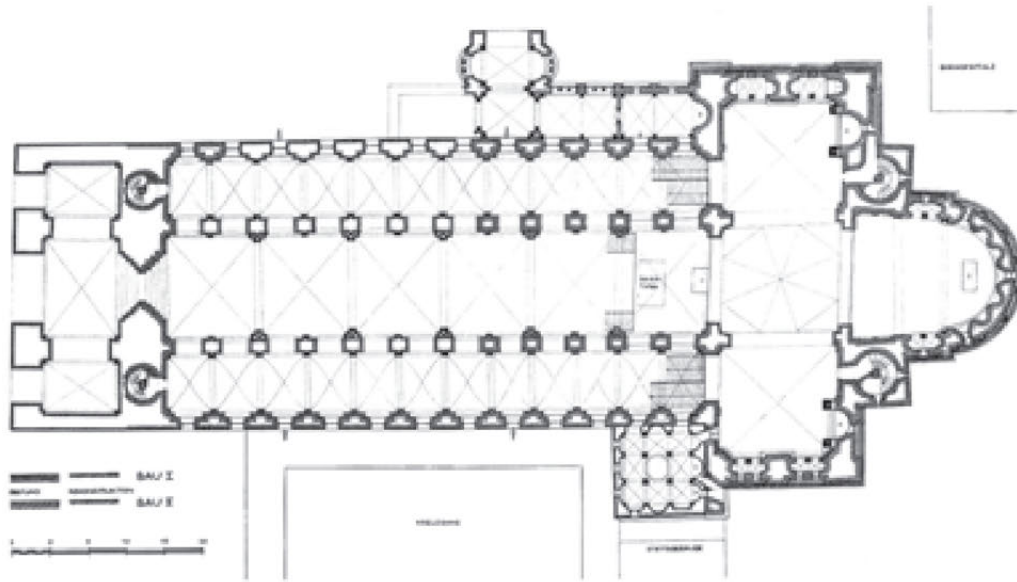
Speyer Cathedral, ground plan, c. 1130 (reconstruction Hans Erich KUBACH & Walter HAAS)
